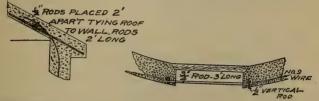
Showing method of tying roof to wall, and of reinforcing across door opening.
